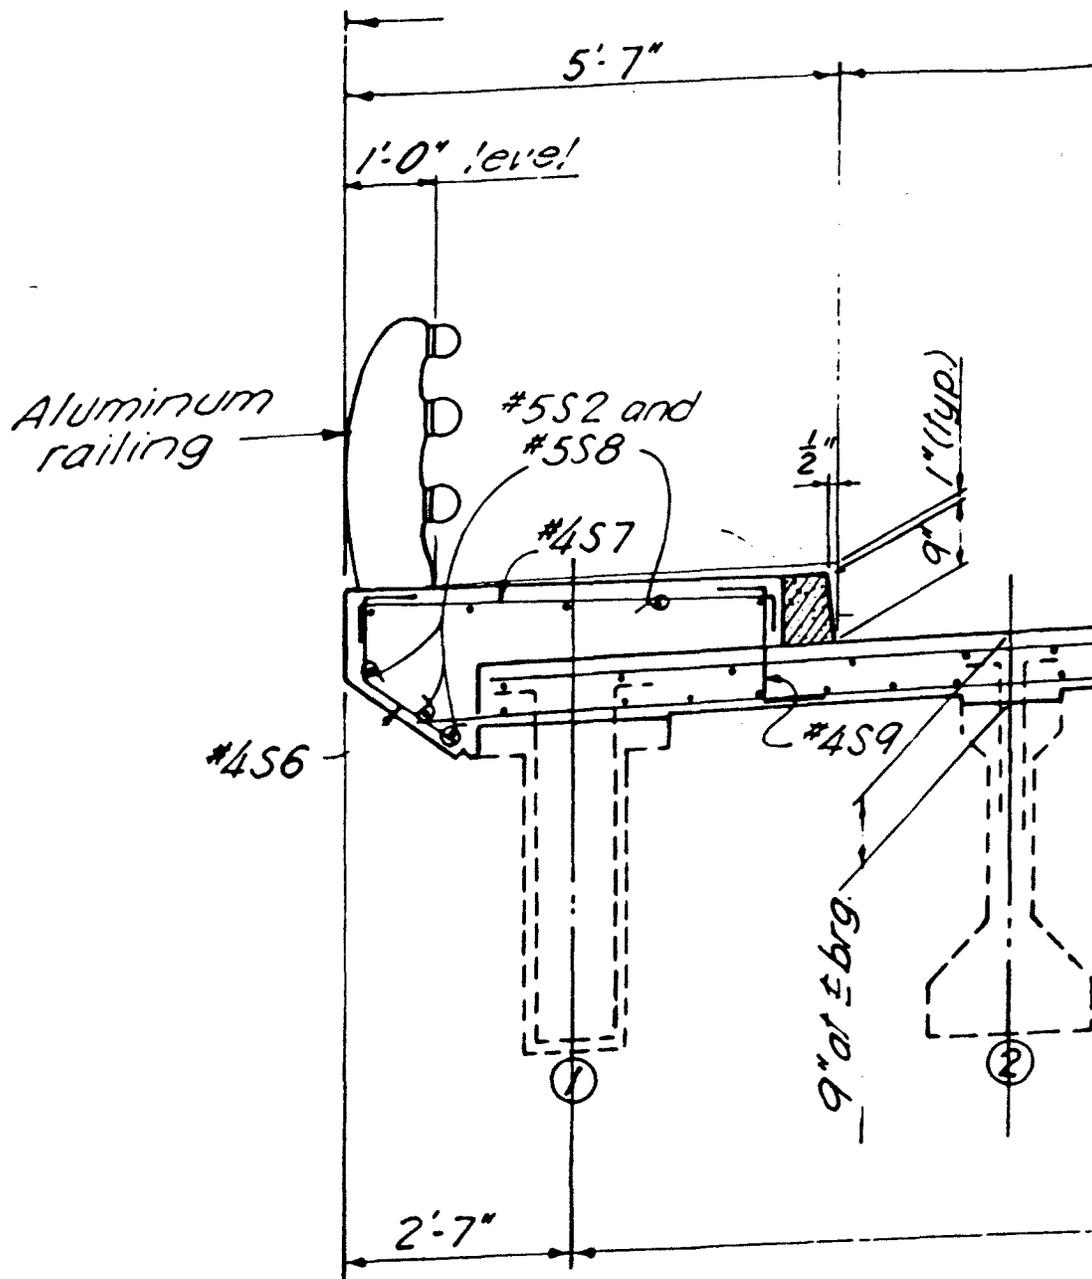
Aluminum Tri-Rail bridge rail with sidewalk (continued).
